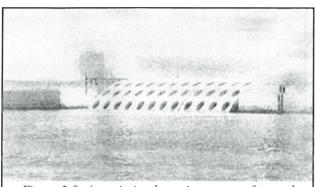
A semi-circular caisson, manufactured at a caisson yard, Miyazaki Port, Japan (taken from Tanimoto et al. 1994).
